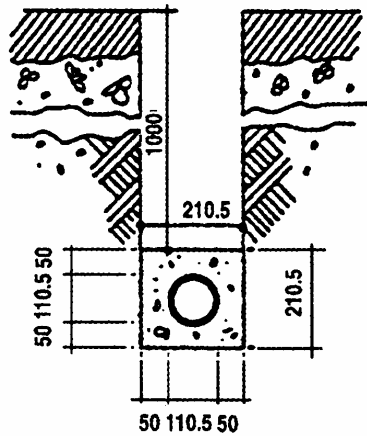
MANHOLE DRAWINGS - TYPE MX4
